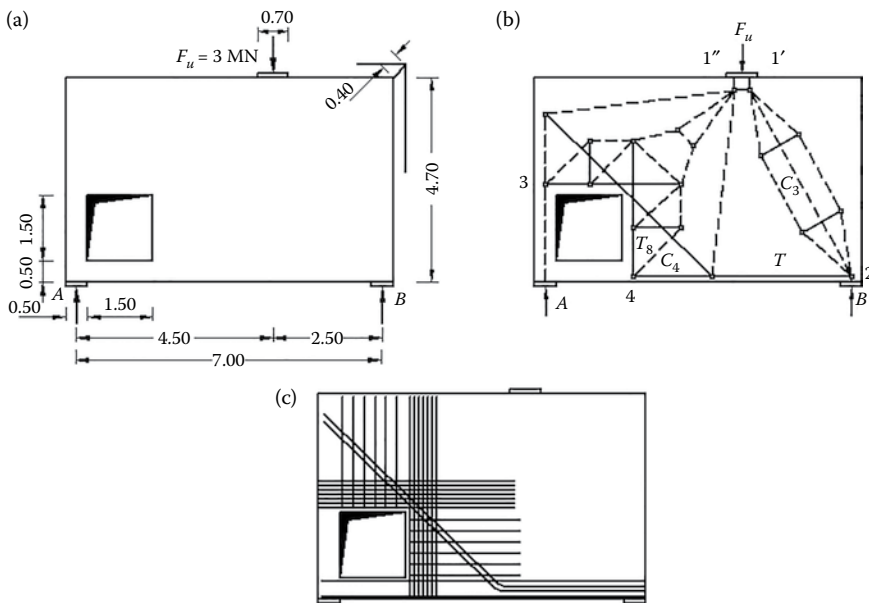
Example of a deep beam with an eccentric large opening (Schlaich et al., 1987; Schlaich and Schäfer, 1993): (a) geometry and loads, (b) *STM*, and (c) reinforcement layout.
